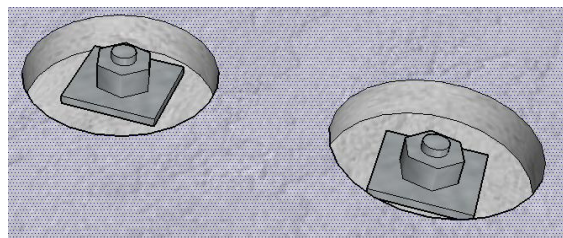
Sunken bolts and nuts to connect piles to prefab elements
